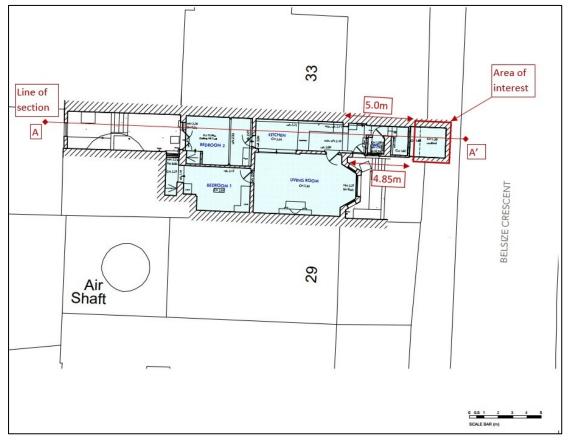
Site Plan (Extract from P-AD Architects, drawing number 7335/01 rev. B)
